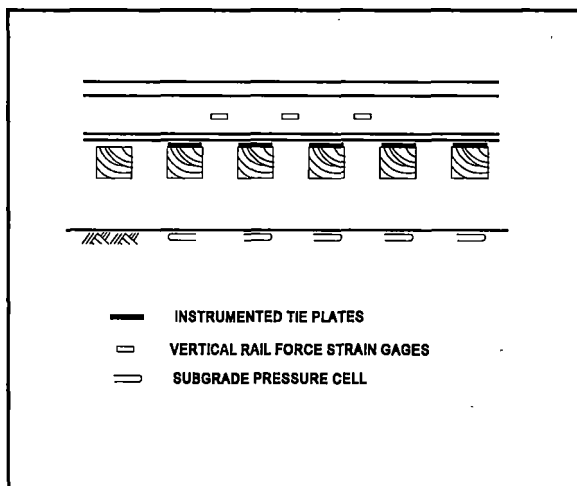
Typical Load Path Evaluation Instrumentation Layout
